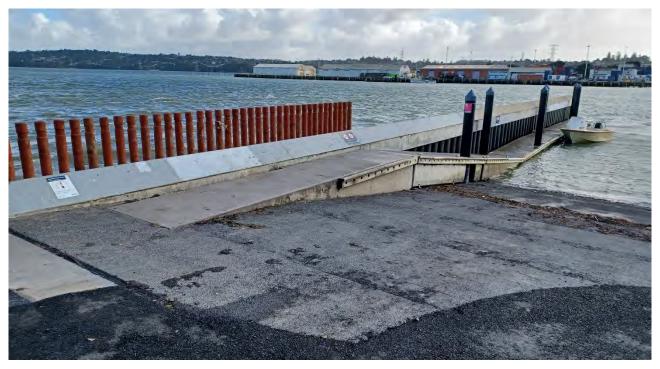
Māngere Bridge boat ramp, Coronation Road. Photo credit: J Morriss 2022
